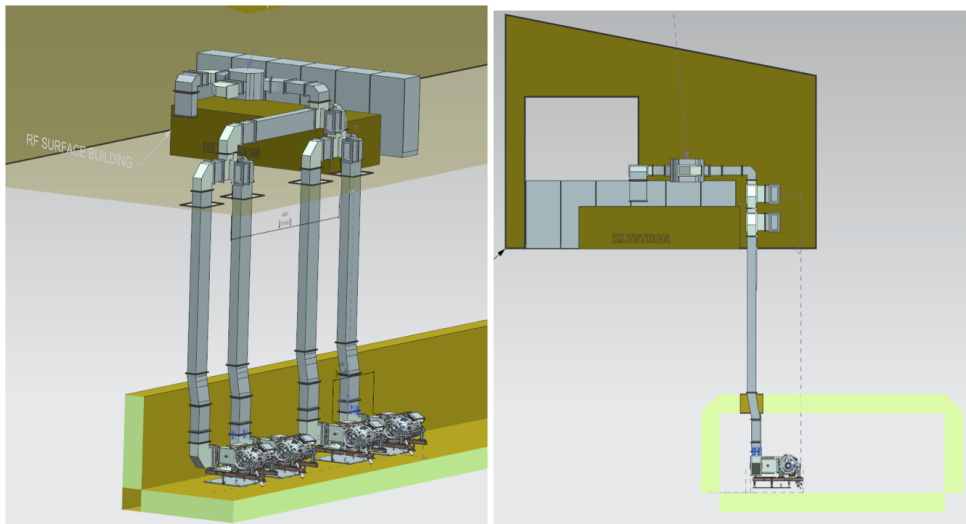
PEP-II RF station layout in tunnel and surface building.
